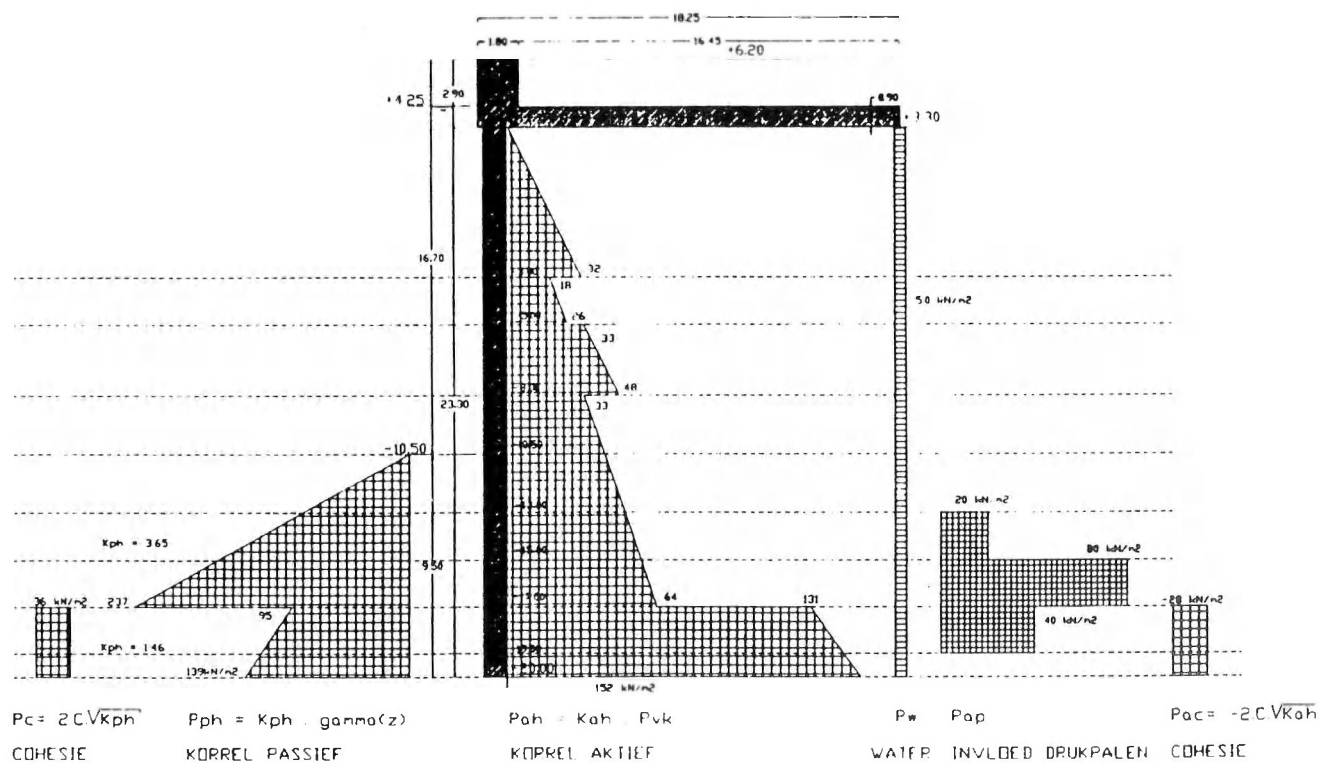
Load diagram on slurry wall (resulting pressure in kN/m³).
